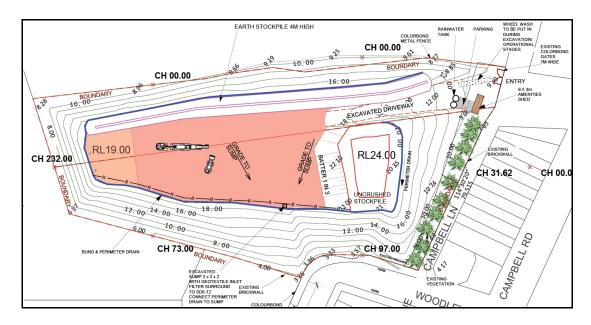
Extract from the subsequent Stage 1 plan of the proposed development. Full details are provided on Drawing No.10, Issue E of the plans of the proposed development at Appendix 9.
